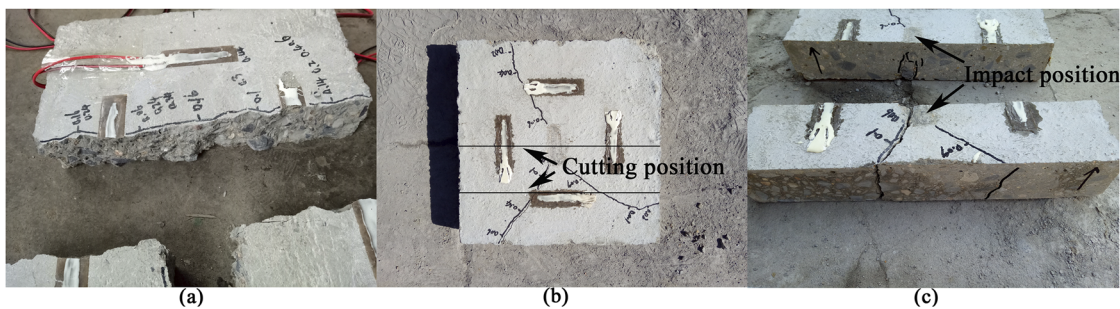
Main fracture surface and cutting surfaces. (a) Main fracture surface. (b) Cutting position. (c) Cutting surfaces.
